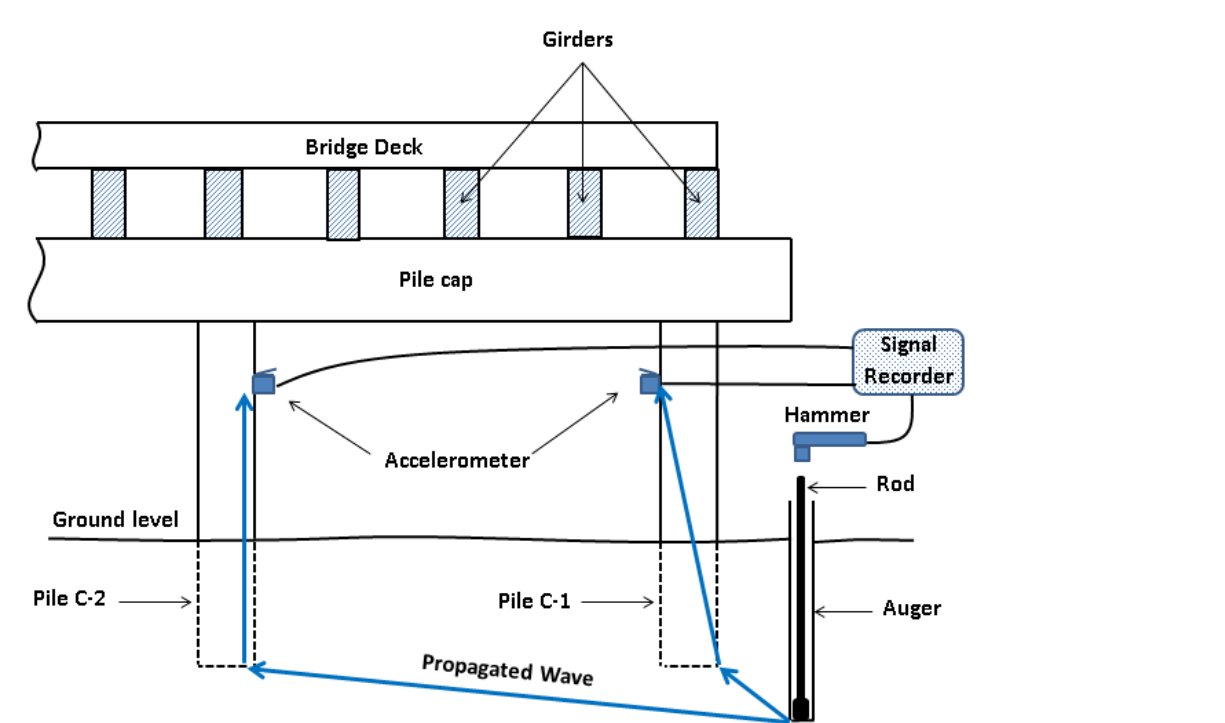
Reverse PS Setup for Piles C-1 and C-2 of Bridge No. 1676
